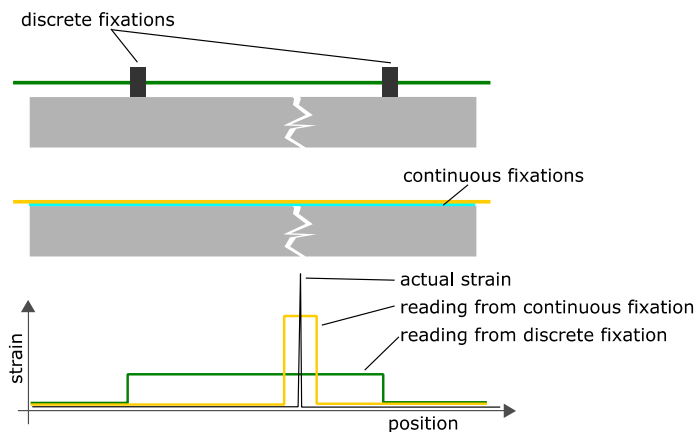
Discrete and continuous fixations of optical fibers to concrete surfaces for crack measurements.
